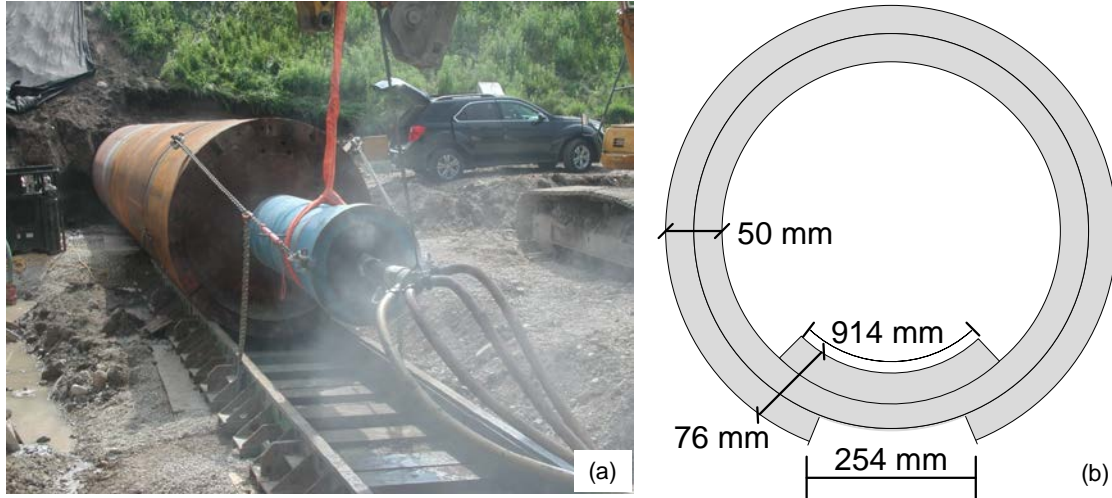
(a) Photograph showing installation of the new 2440 mm culvert parallel to the failing CMP culvert, and (b) geometry of the cutting shoe.
